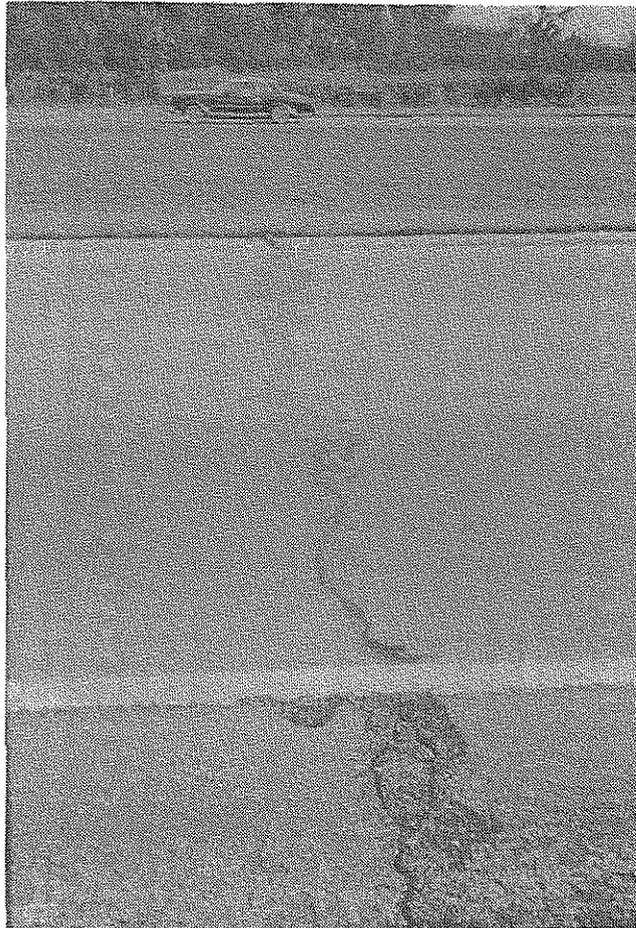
Photo of Sealed Crack Over Pressure Relief Joint on OH070066.
